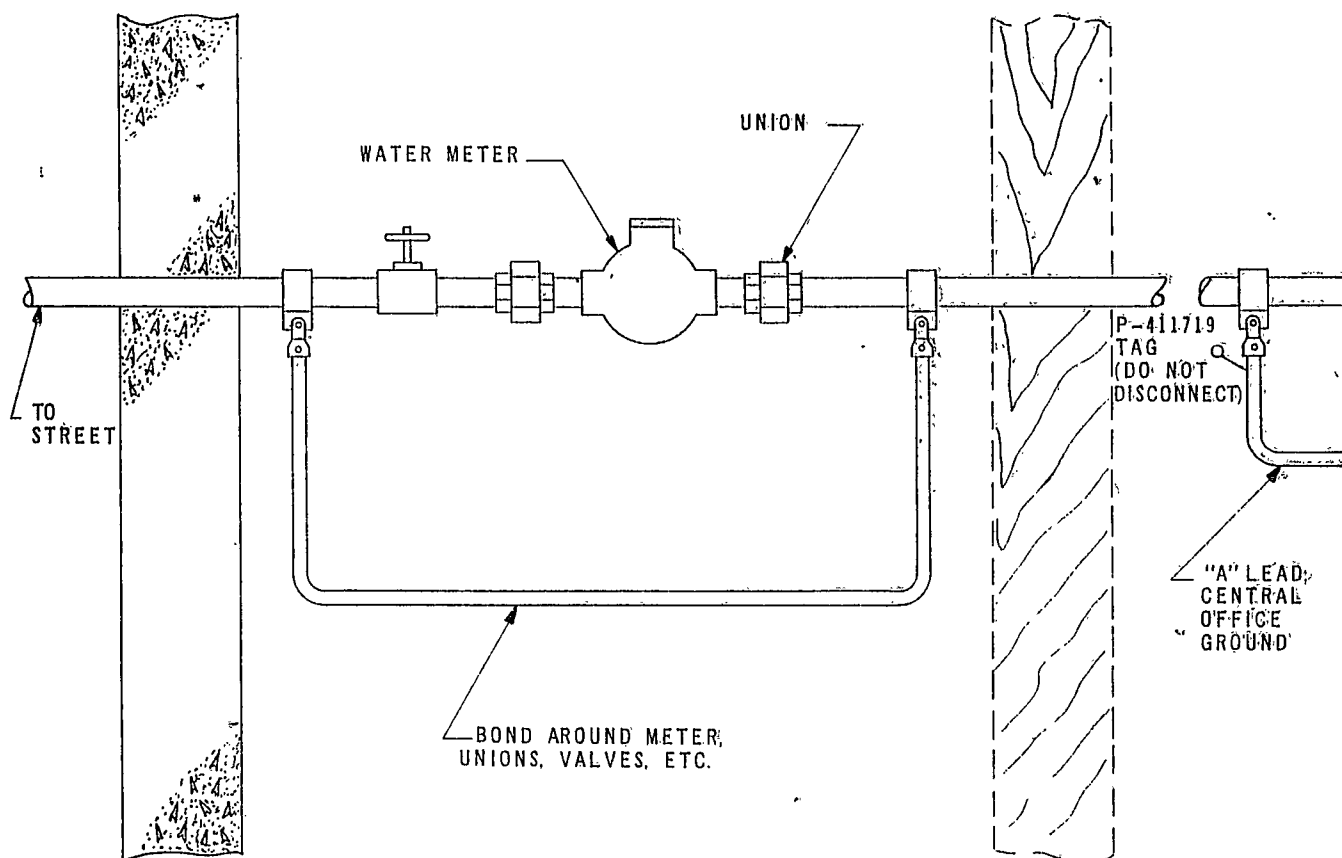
WATER PIPE GROUND ARRANGEMENT WHERE IT IS NOT FEASIBLE OR ECONOMICAL TO CONNECT "A" LEAD TO STREET SIDE OF METER AND BOND IS REQUIRED (PAR. 5.45)
